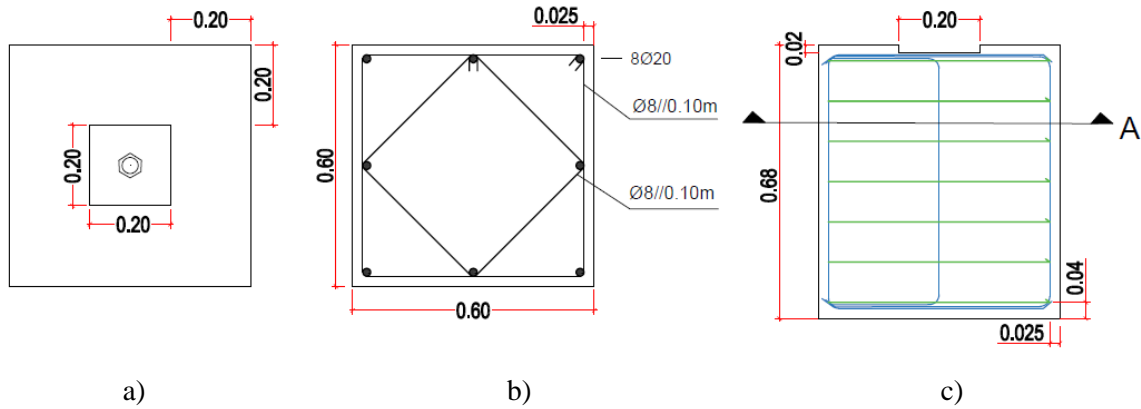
Columns detailing: a) Top view; b) Section A; c) Front view.
